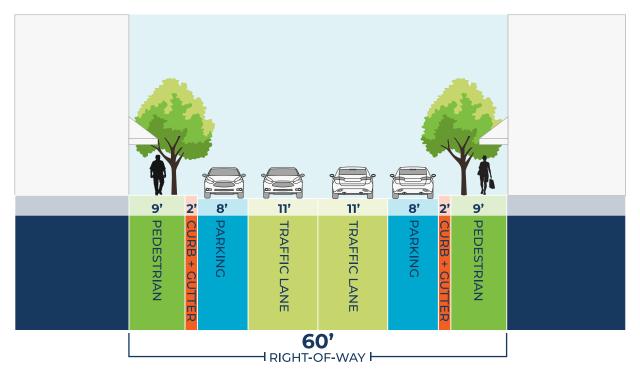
// PROPOSED ROAD SECTION IN OLD TOWN
